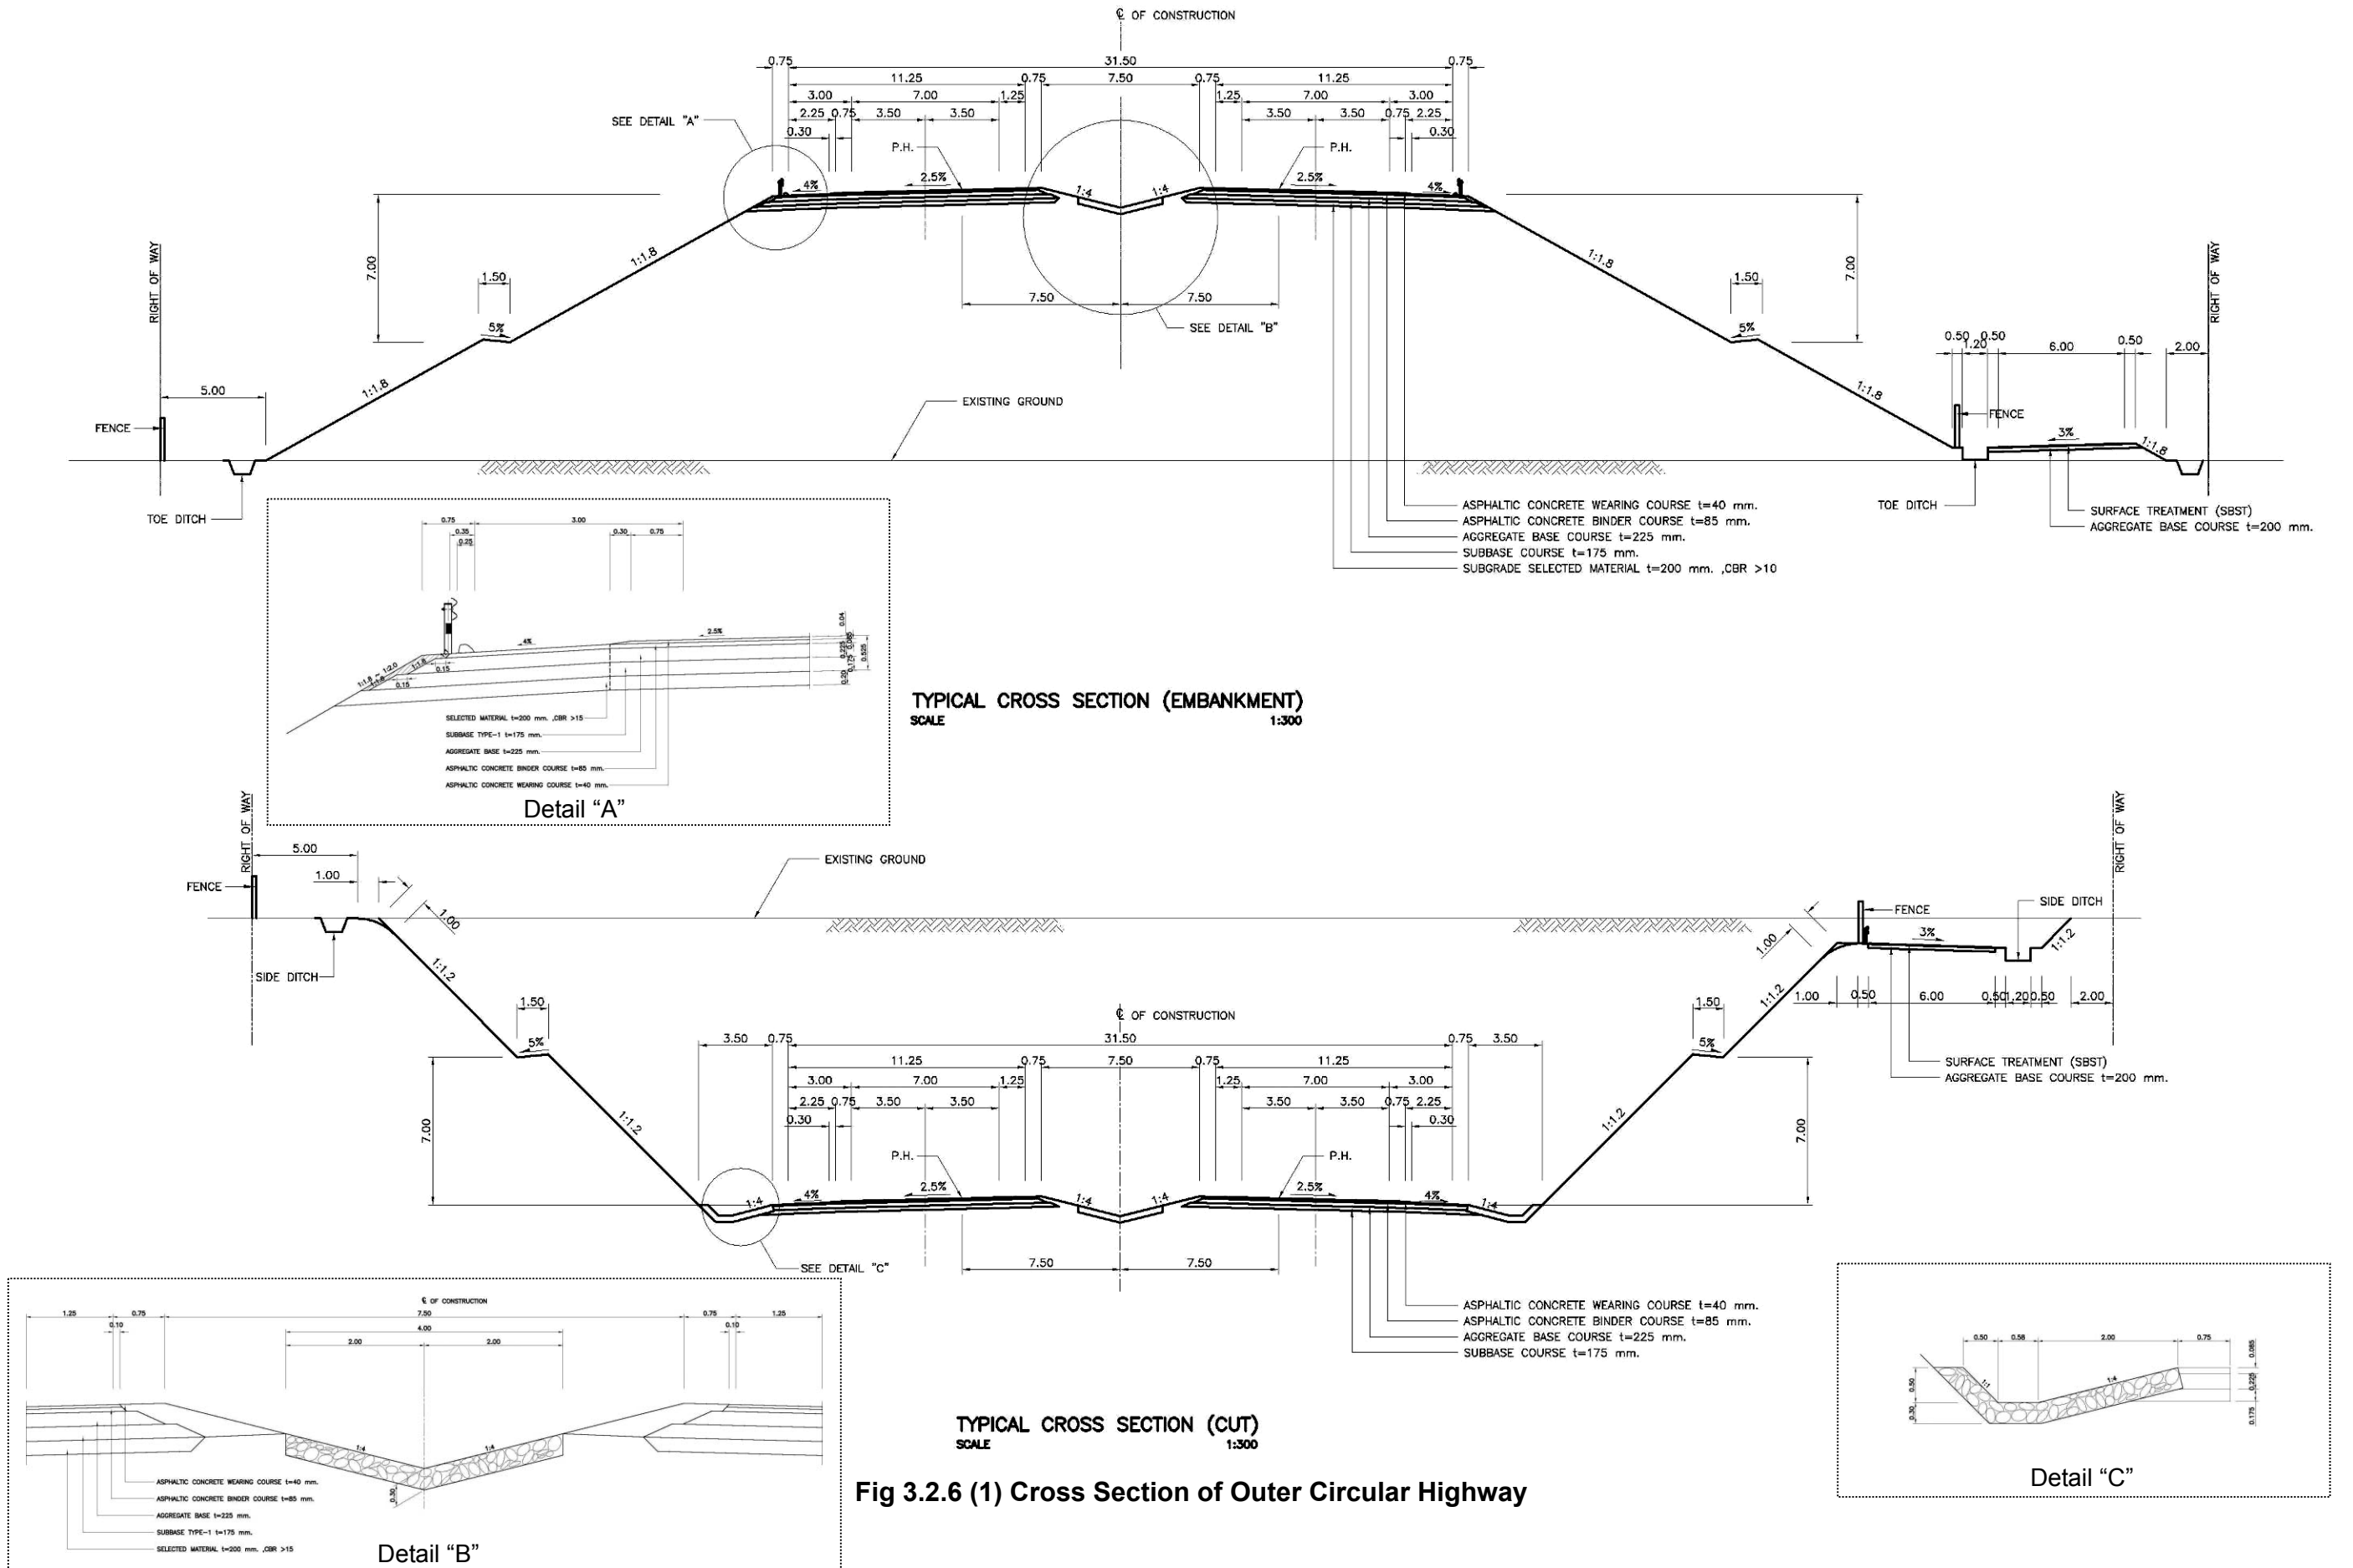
(1) Cross Section of Outer Circular Highway
